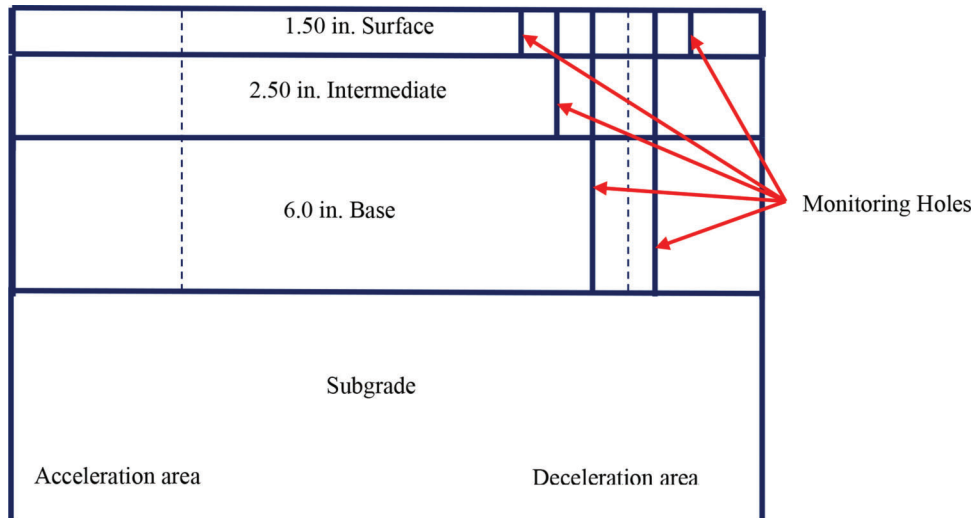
Longitudinal cross-section view of monitoring holes in the pavement structure.
